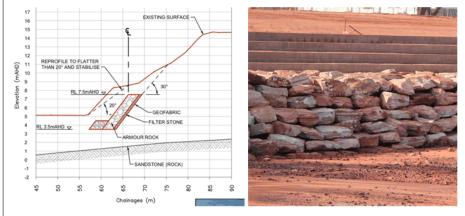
Typical section of Option 1 (left) and example low crested revetment (right).
